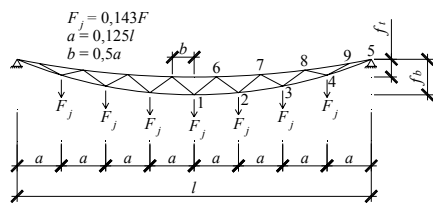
Cable truss with tensioned elements. a – distance between load, l – span, F – load; f – truss height, f_b – bottom chord camber, f_t – top chord camber
